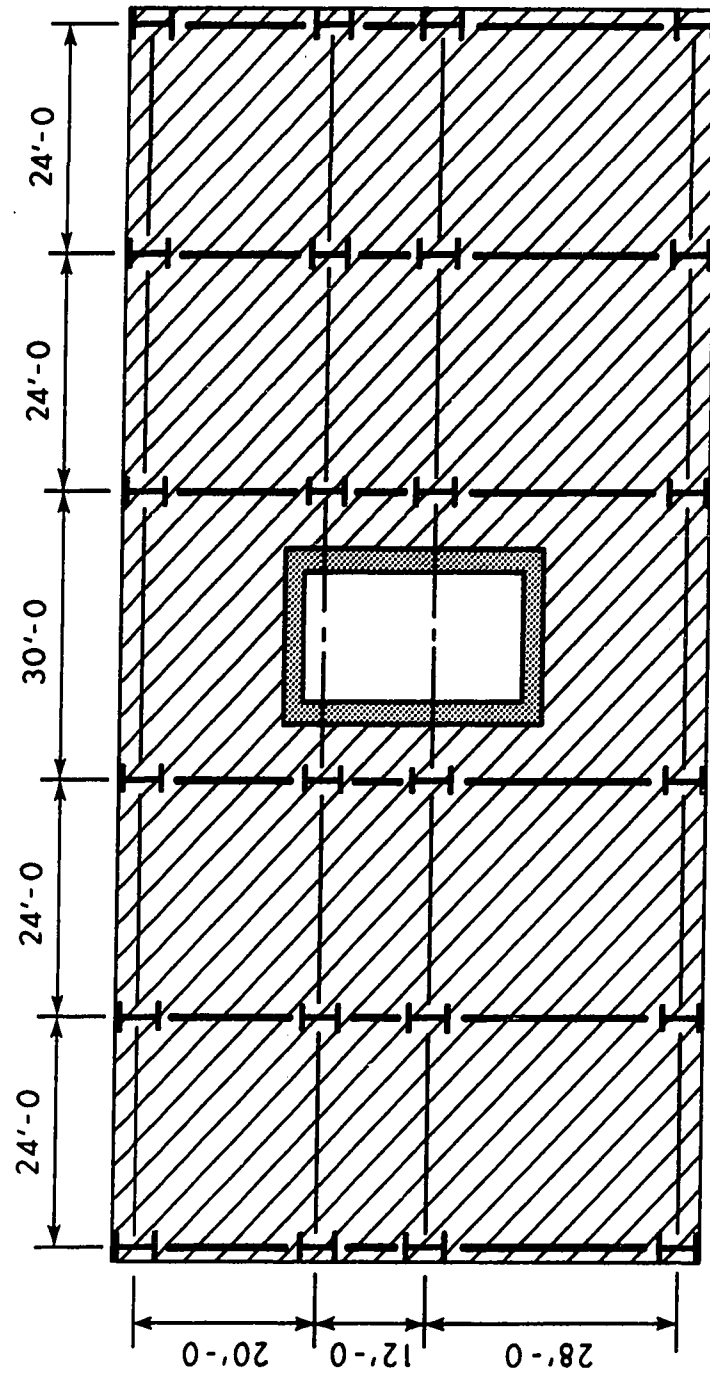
PLAN VIEW - 24 STORY BUILDING
